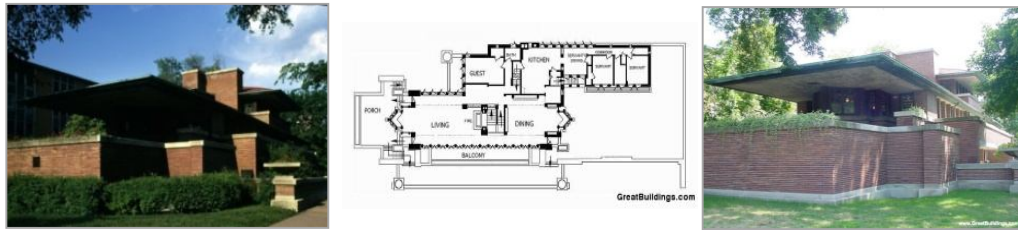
Robie House, 1908 (Great Buildings Collections, n.d.).
